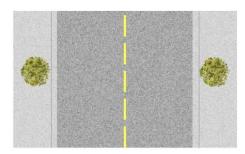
continued* Standard MPAH Cross Sections
